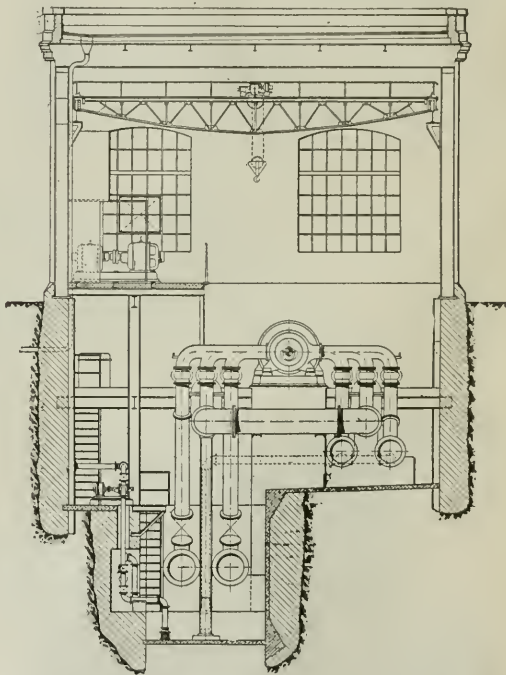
Cross-section, Port Arthur Pumping Plant
